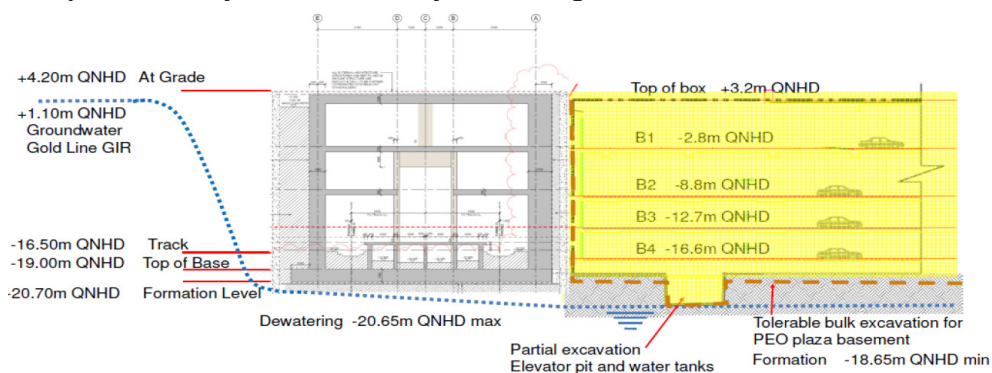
Cross Section of Future Development Excavation and Groundwater Control
